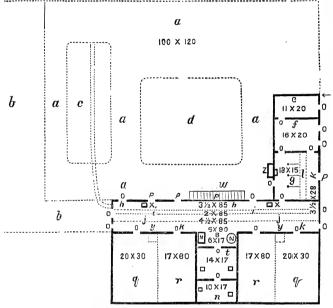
Plan of Basement, Wing and Barnyard—a a a, Barnyard, surrounded by high tight fence; b b, Lane to Pasture, &c.; c, Manure Pile, with elevated track for manure truck; d, Straw Stack if needed; e, Shop and Tool Room, with chimney and coal stove; i, Carriage Room; g, Stable for four horses; h h, Walk behind the cows; ii, Water-tight Manure Gutter behind cows; ij, Row of Cows, stanchioned; k k, Feed Passage and Walk; l, Horse Mangers for hay and grain or cut Feed; M, Water-tight Box on four wheels, for carrying water or cut feed; N, Tank supplied from cistern in bank by underground iron pipes and regulator; o o o, Doors; p p p, Windows, q q, Hay Bays from roof to basement; r r, same with movable barn floor for each; s, Space for water tank and mixing trench; t, Meal Room or Granary, with trap-doors from bent-floor; w, Covered Stairway for horses, from barn floor to horse or cow stables; x x, Landing from straw shoots above; y x, Landing from the stave shoots above; n, Water Tank, fed from cistern, for horses, and for cattle in yard in summer; n, Root Cellar or Meal Room.
